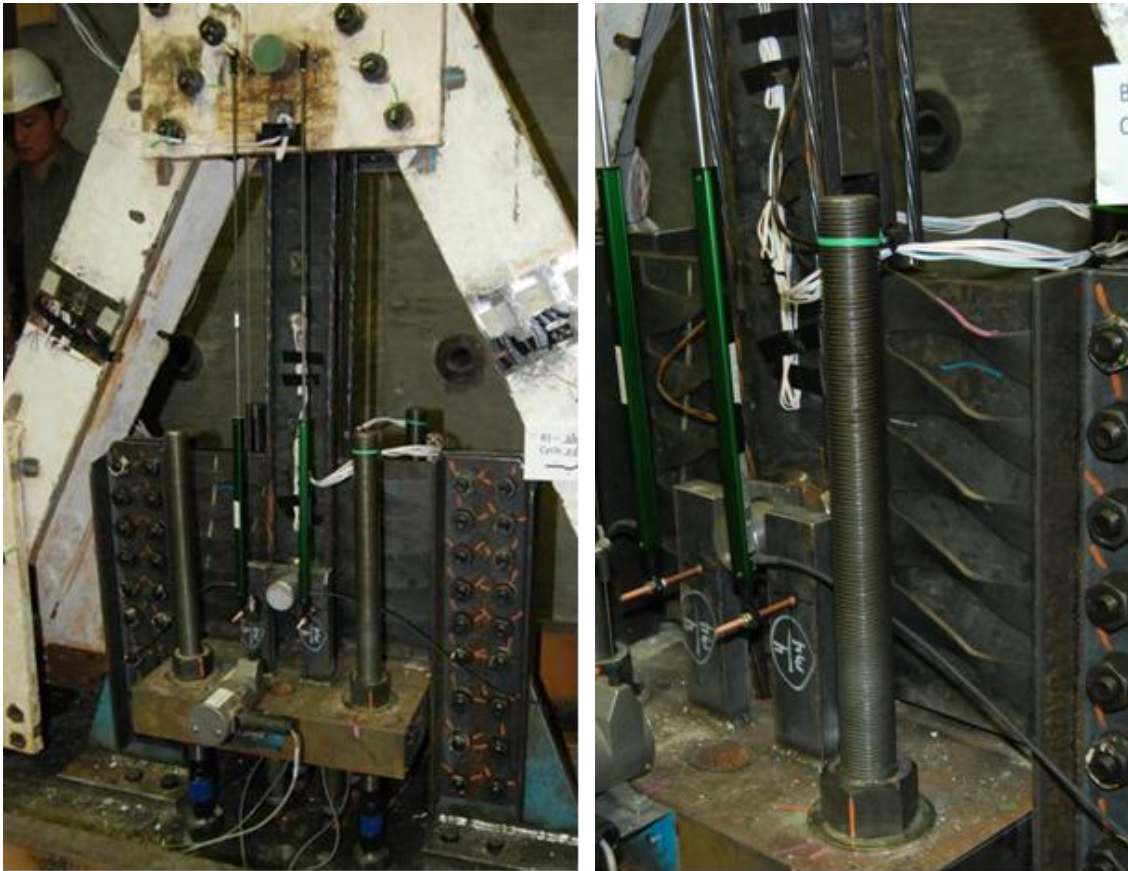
Photograph of the Specimen B2 Fuse Assembly (Left) and Photograph of the Deformed Fuse (Right)
